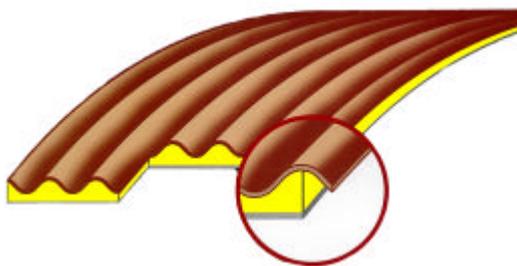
An insulation thickness of 30 to 80 mm can be applied between fibrous-concrete or painted steel facings
